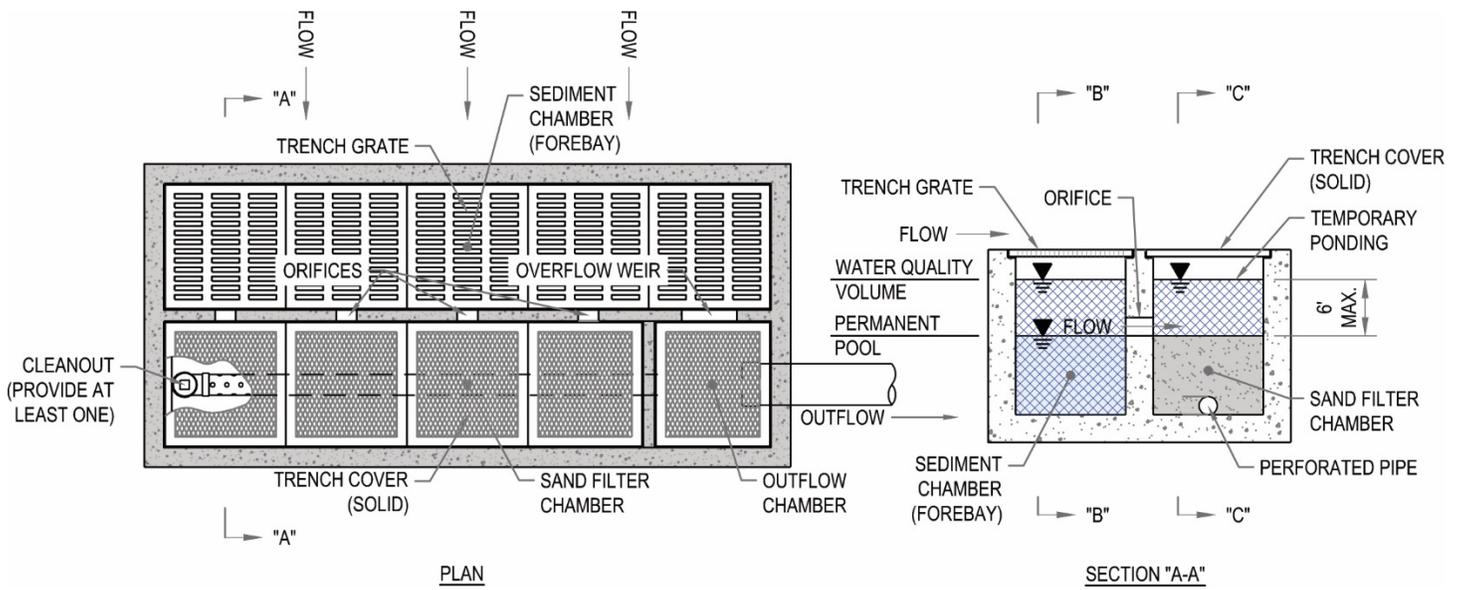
Closed Bottom Sand Filter Example: Plan and Cross-Section
